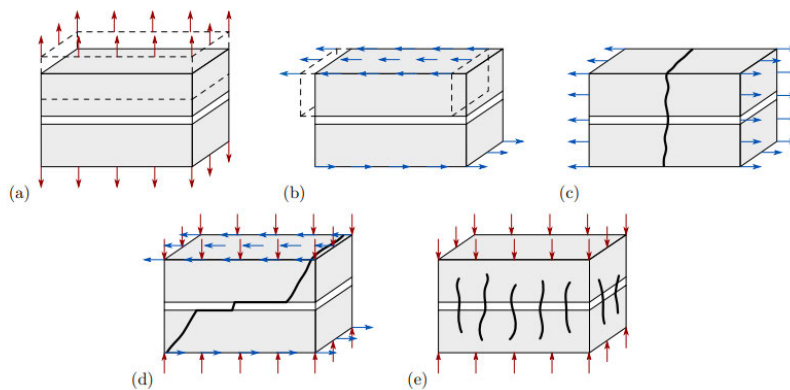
Masonry failure mechanisms: (a) joint tensile failure, (b) joint shear failure, (c) brick and mortar tensile failure, (d) diagonal masonry failure, and (e) masonry crushing. (Lourenco et al., 1997)
